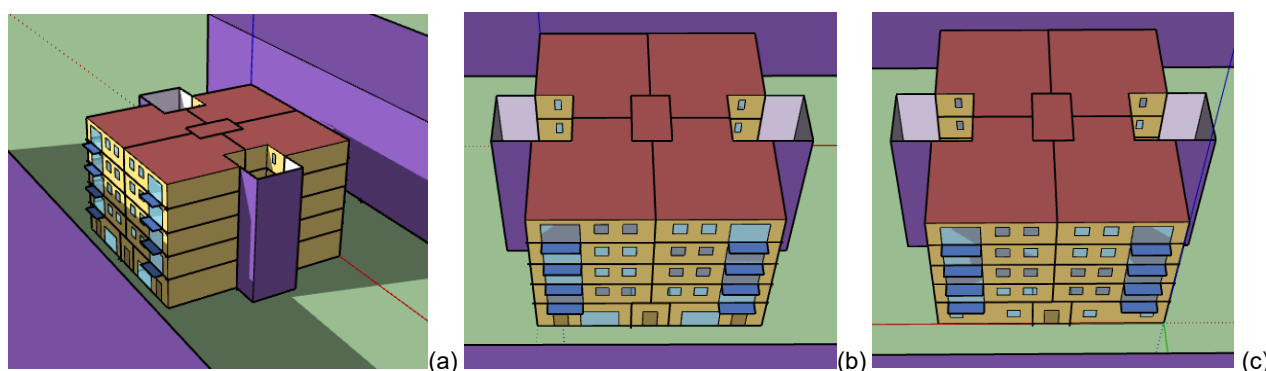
Views of the (a) total (b) south exposed facade (c) north exposed facade of the studied building
